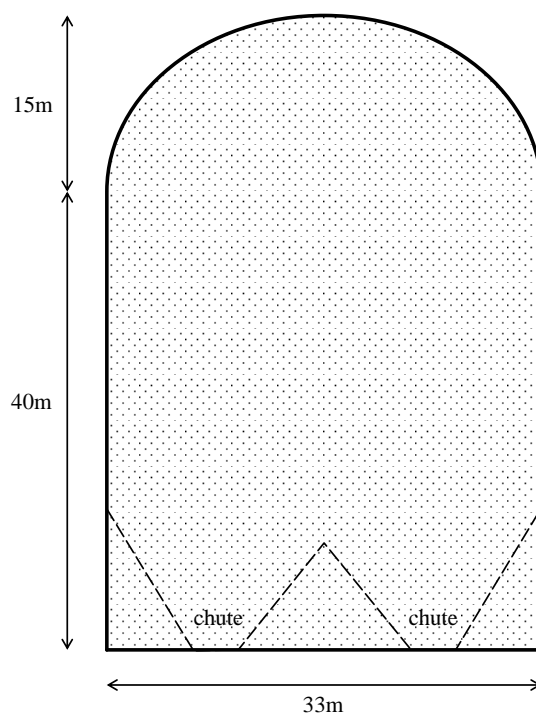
Cross Sectional Shape of Coal Storage Silo
